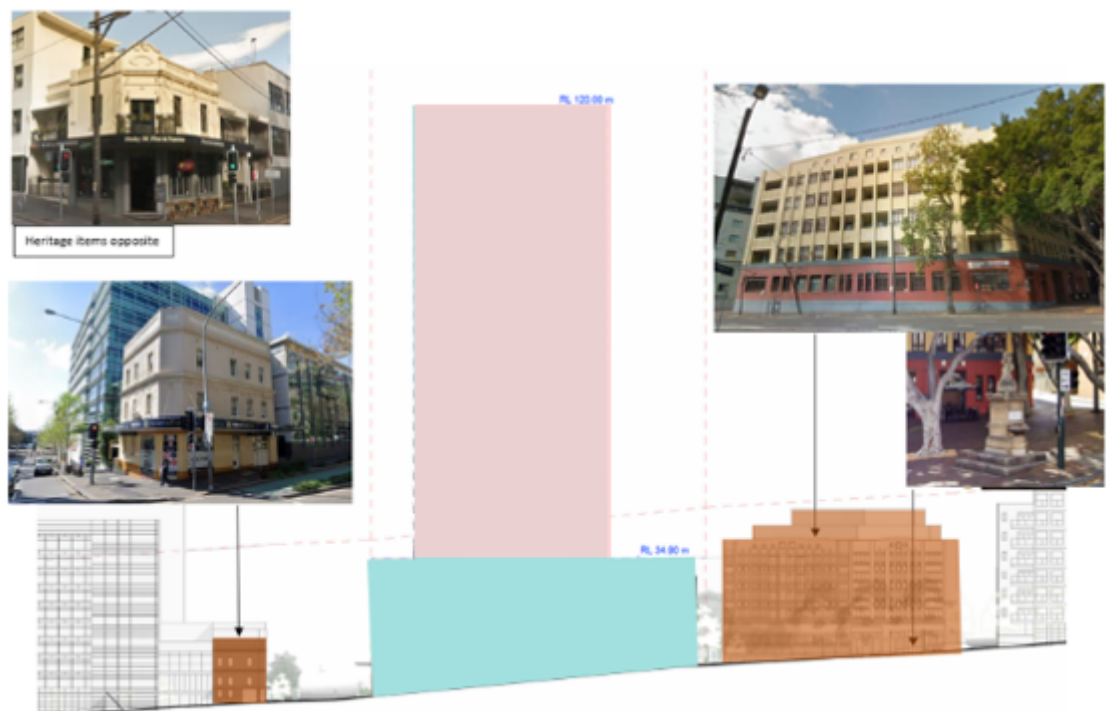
Edward Street elevation with Heritage Items opposite and adjacent to the site
